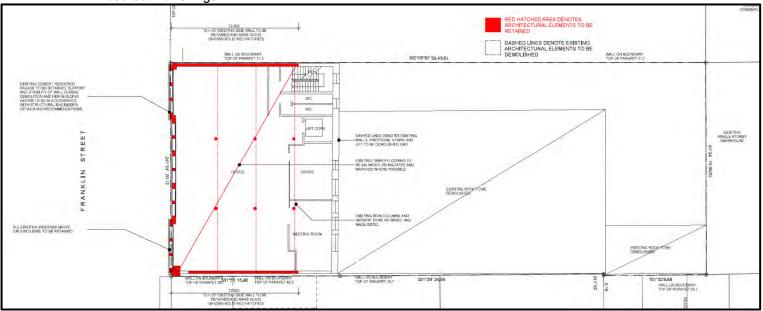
Excerpt from Drawing No. TP-004 detailing extent of demolition / retention
